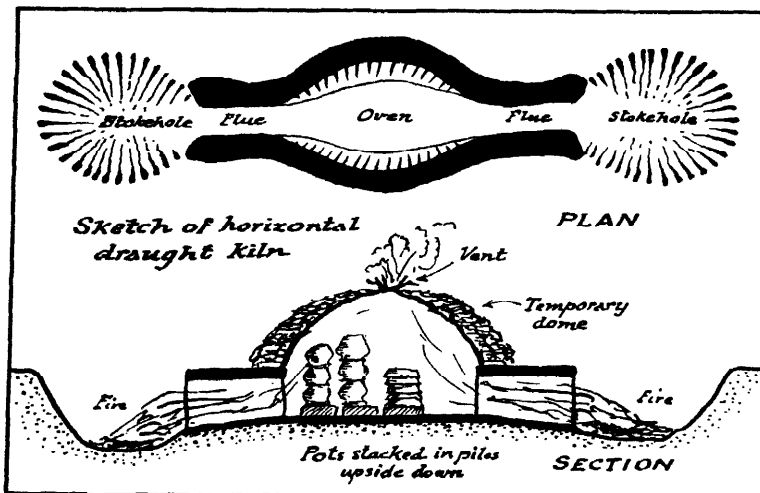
A typical horizontal-draught kiln. Sketch plan and section
